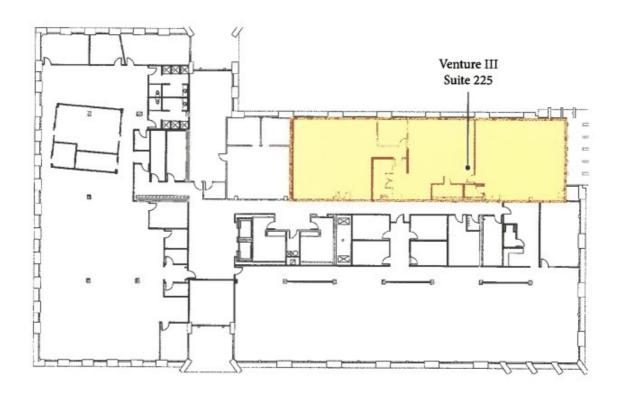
EXHIBIT B FLOOR PLAN OF PHASE II SPACE
